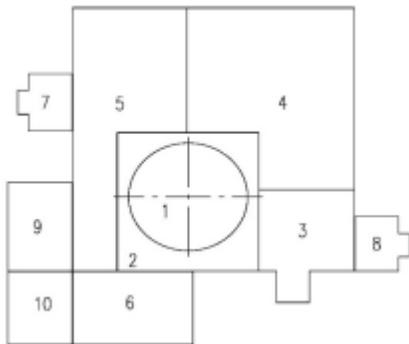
Plant arrangement of ACP100 (IAEA, 2018)
